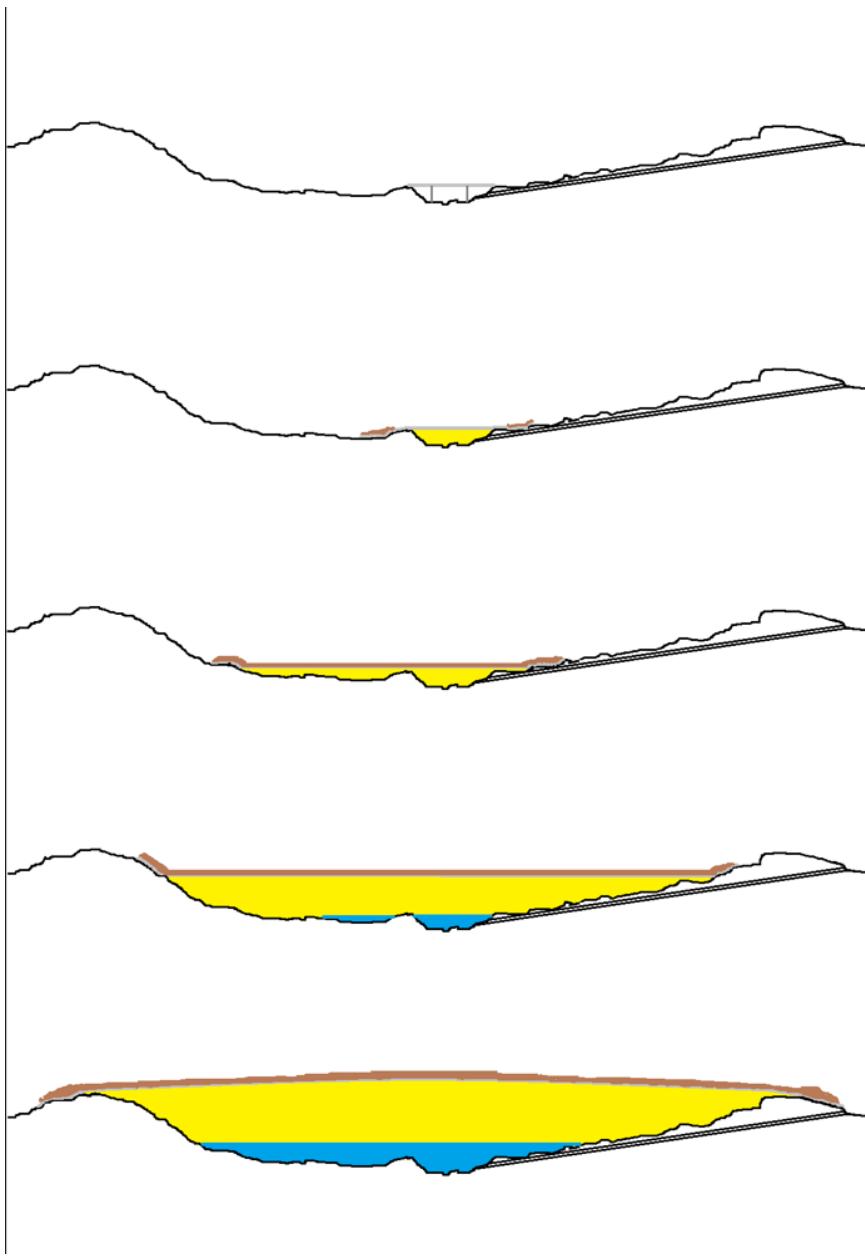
Construction of Steel Roof over time. Yellow is atmosphere, Blue is water, Amber is regolith top cover. Not shown- spaced periodically steel cables will extend down from the roof to anchor it but that the cables will have considerable give to permit roof to flex.
